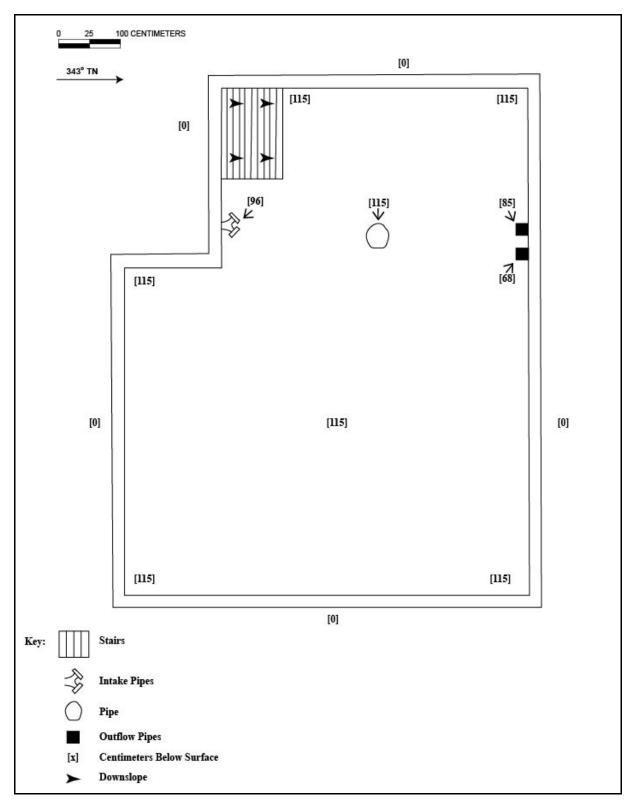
Plan view of SIHP # 50-80-15-4042, historic Waimānalo Irrigation System pump house foundation (from Zapor and Shideler 2016:14)
